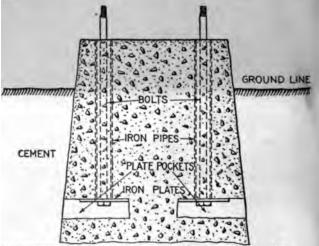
,734.—Concrete foundation showing method of installing the anchor bolts.
